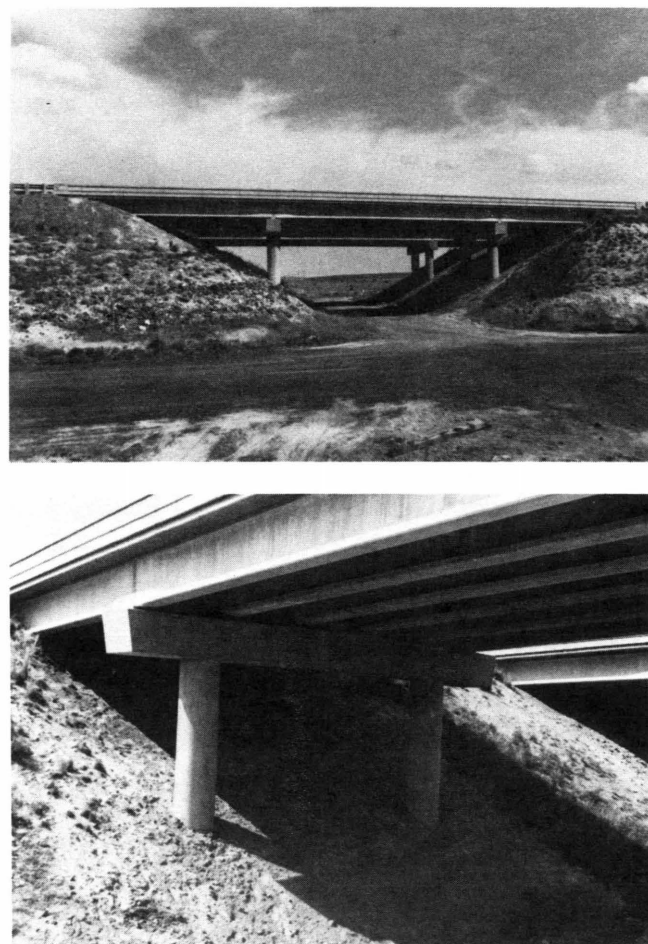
Test bridge: top, south view; bottom, west bent.
